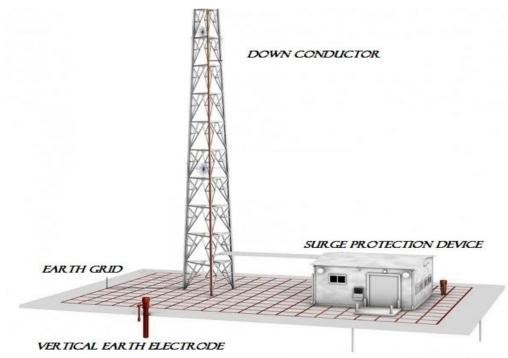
Sample representation of Lightning protection, Surge Protection and Earthing for building located near metallic structure.
